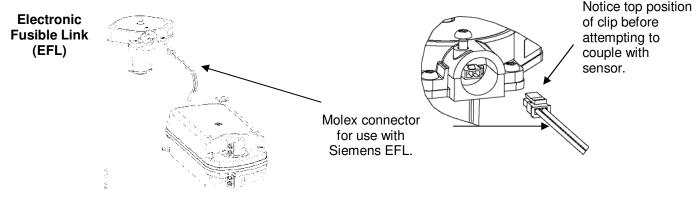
GND EFL Models Come Pre-wired for Assembly.
